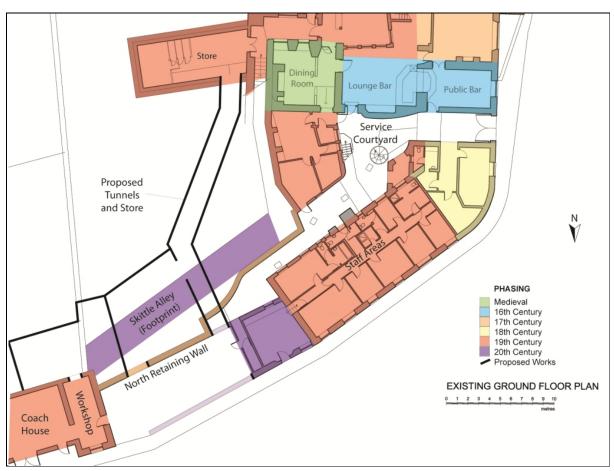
Phased plan showing the existing ground floor and proposed tunnels. Note the Skittle Alley is at first floor level.
